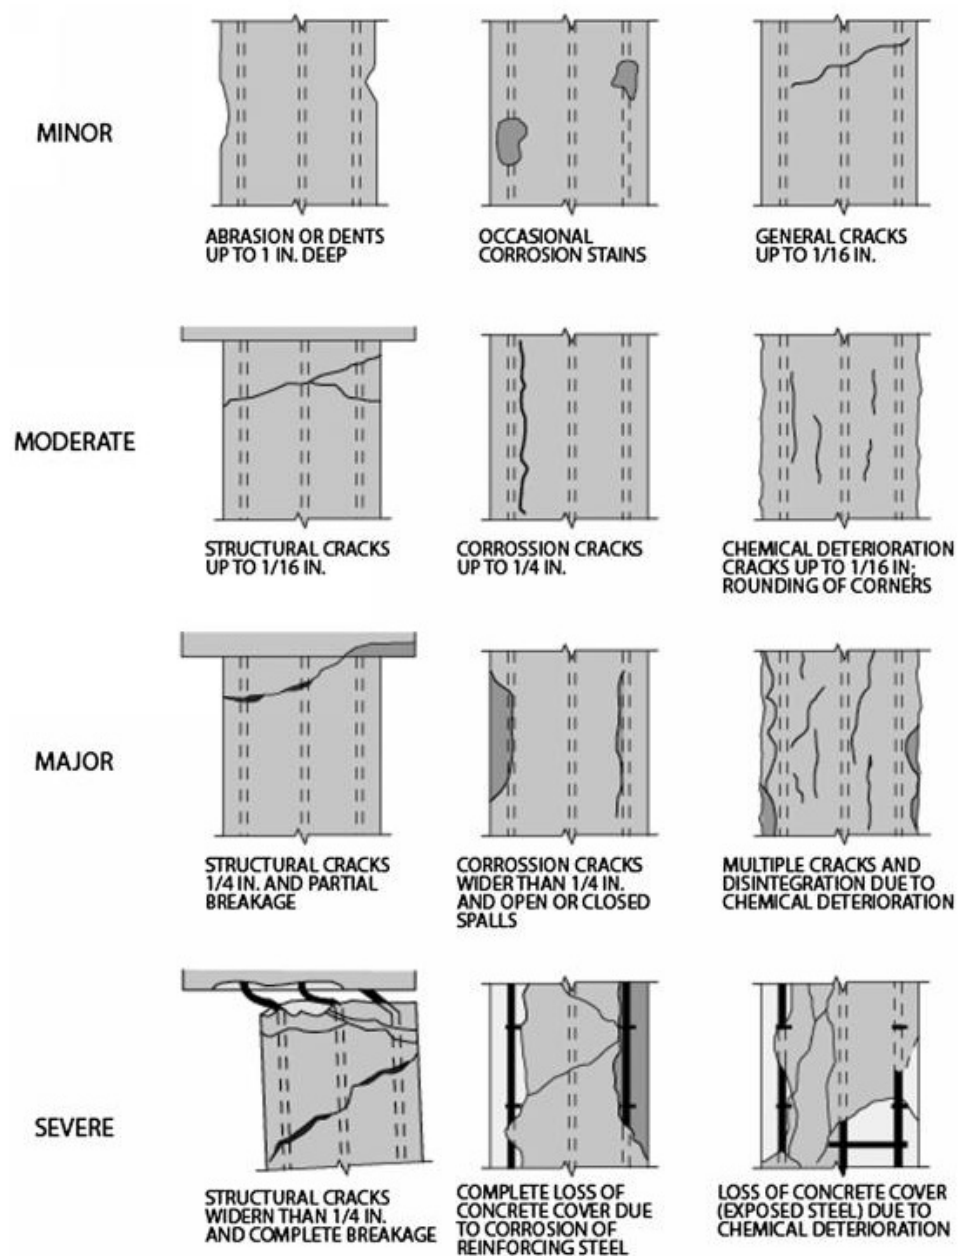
Damage ratings for reinforced concrete elements
